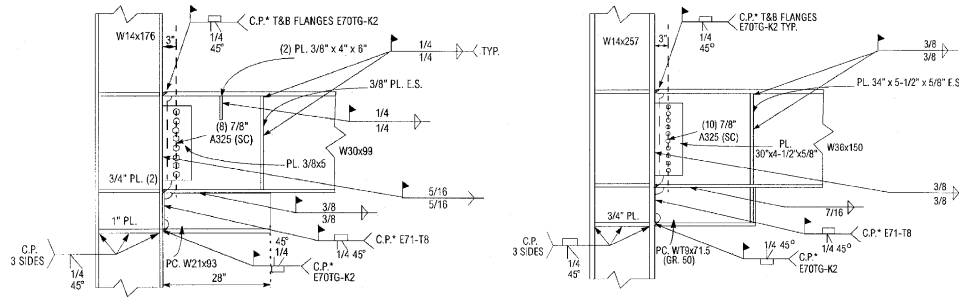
Welded straight haunch test specimens (SAC [9]), (a) UCSD test specimen, (b) UCB test specimen.
